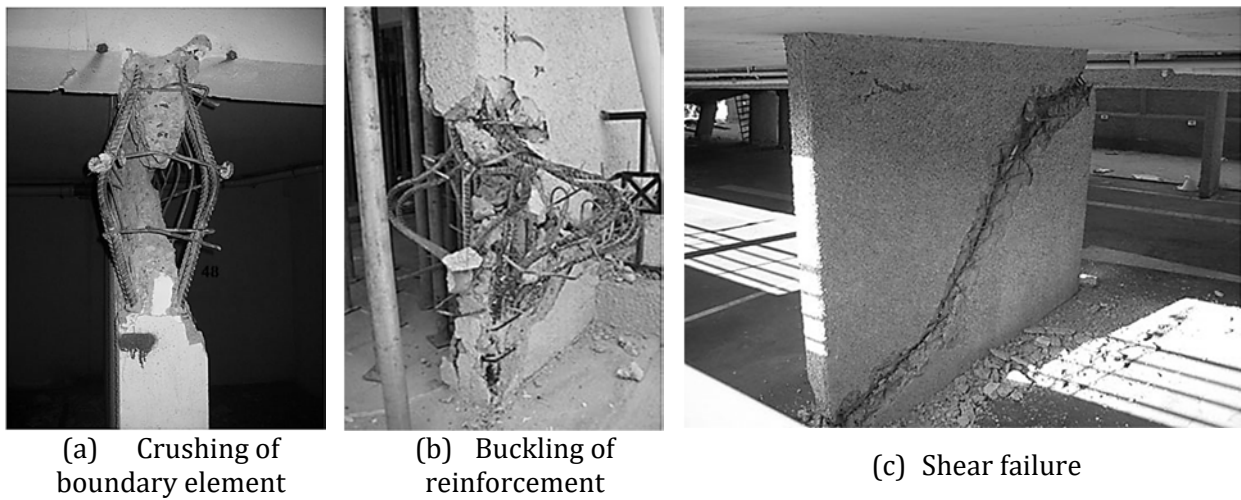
Failures in reinforced concrete structural walls after the Maule (Chile) 2010 earthquake^[3]
